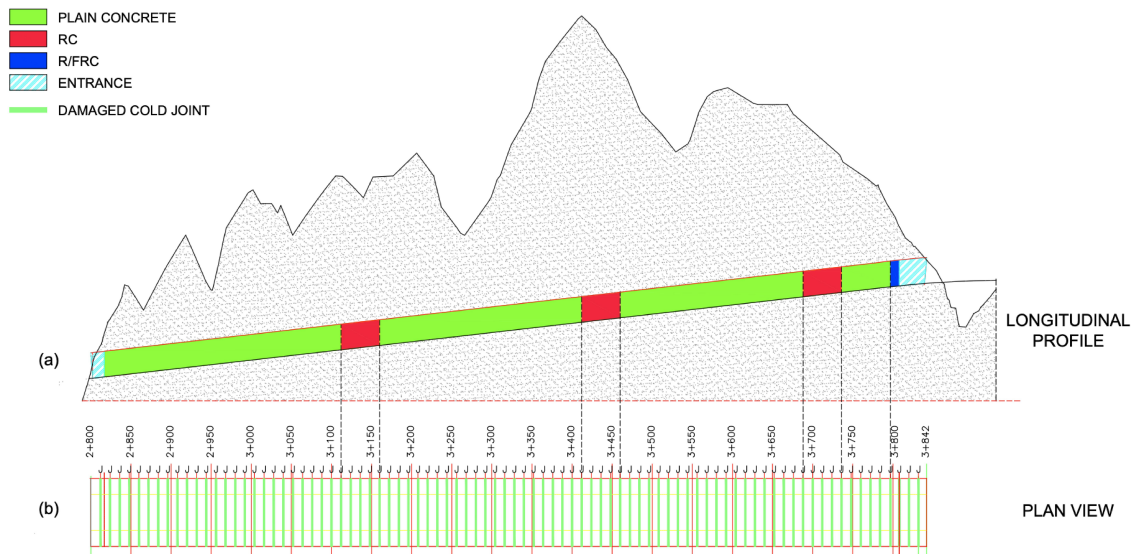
Tunnel #1: (a) longitudinal profile with the type of resisting cross-section; (b) plan view of the panels with the cold joints.
